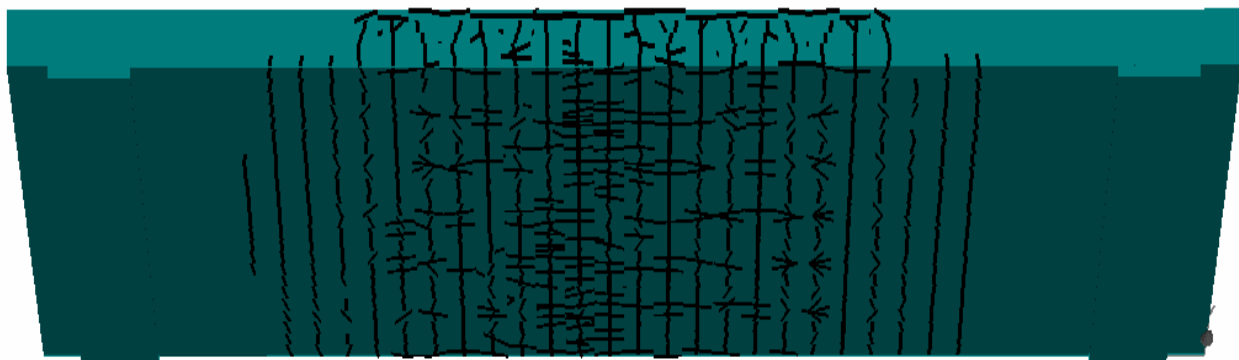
All cracks at bottom surface of the slab at deflection of 12.80mm
